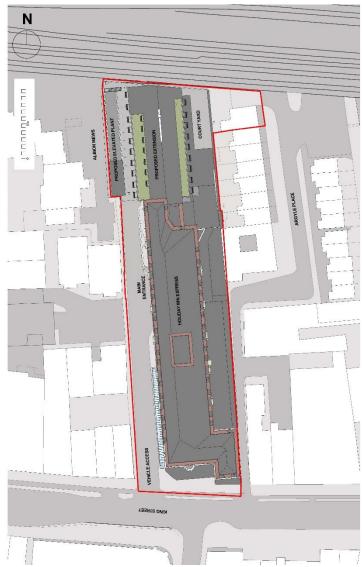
Proposed site plan (outlined in red). Adapted from drawing no. HIXH-FEA2357-EX-XXX-PL-A-05002 (Franklin Ellis Architects, 2011).
